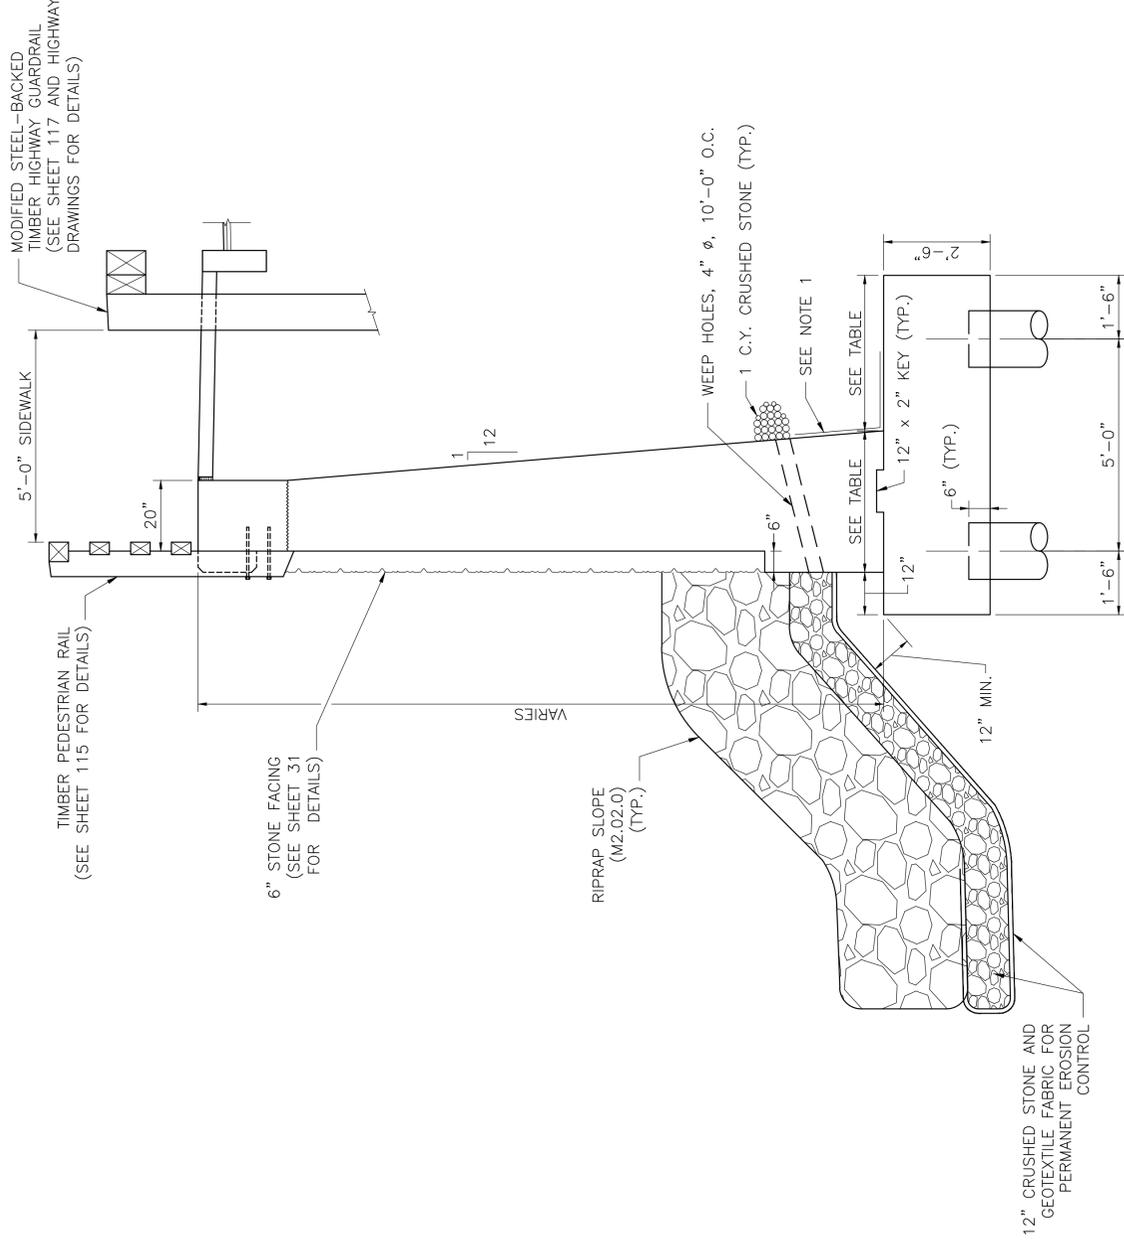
DETAIL A - ABUTMENT FOR EXPOSED CONCRETE DECKS
